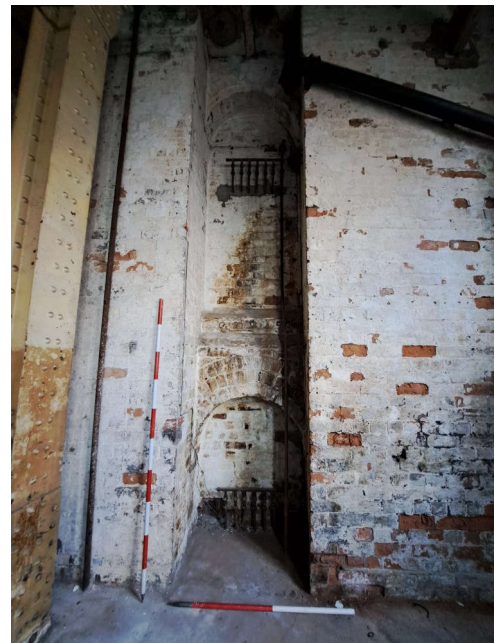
Detail of the northernmost set of arches in the east-facing wall between Buildings 2 and 4. 1 x 2m scale, 1 x 1m scale
